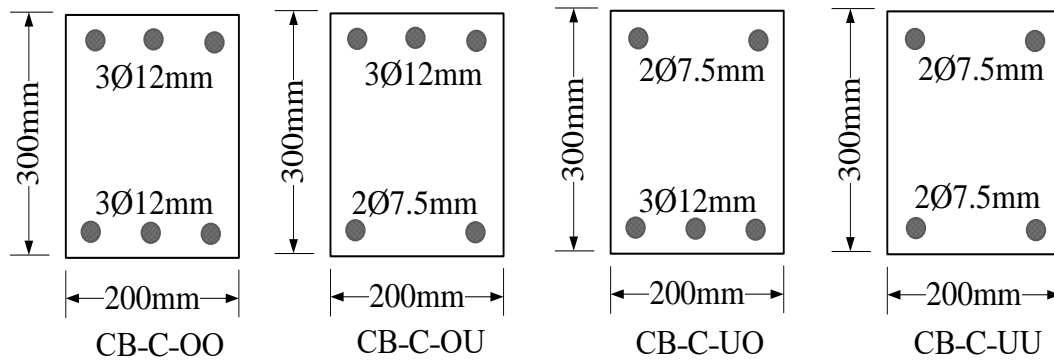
Reinforcement Details and Configurations of CFRP- Concrete Beams.
